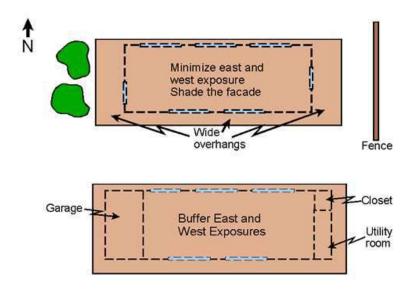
Best ways of building position. (Window Orientation And Shading 2007)
